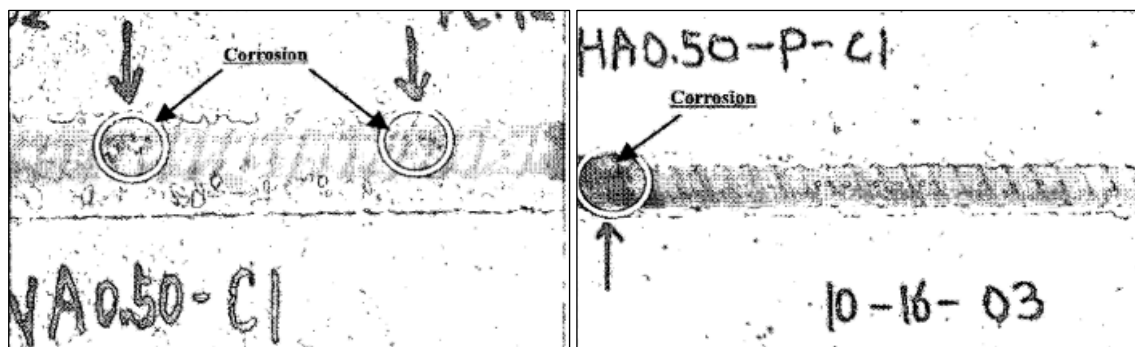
Photograph of corrosion on the as-received rebar embedded in low alkalinity type specimen (left) and on the polished rebar embedded in high alkalinity specimen (right)[143]
